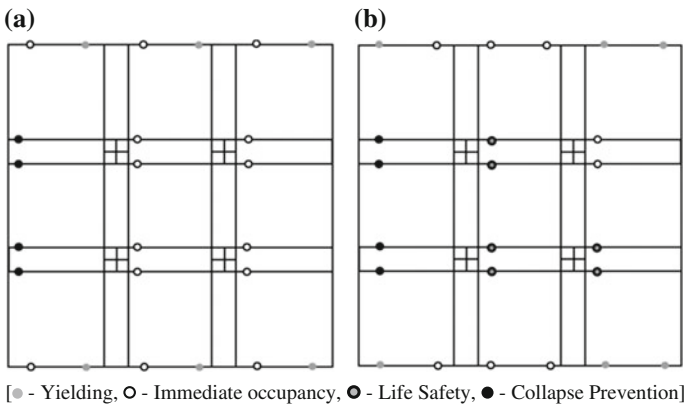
Typical hinge patterns of flat slab buildings with edge beams: a 5 storey building, b 10 storey building
